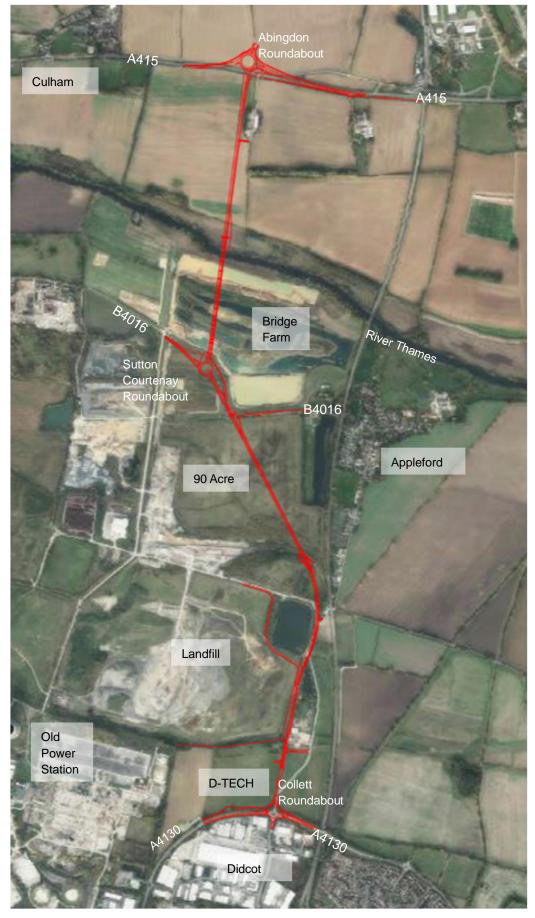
Didcot to Culham River Crossing Layout Plan
